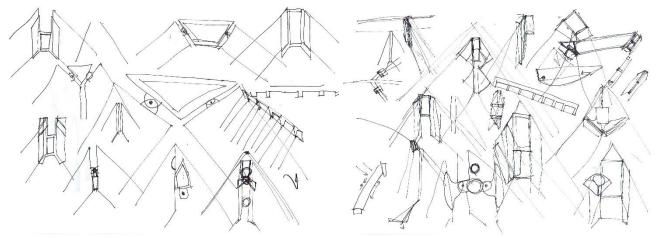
Hand sketches for the top detail. Source: own ill.
